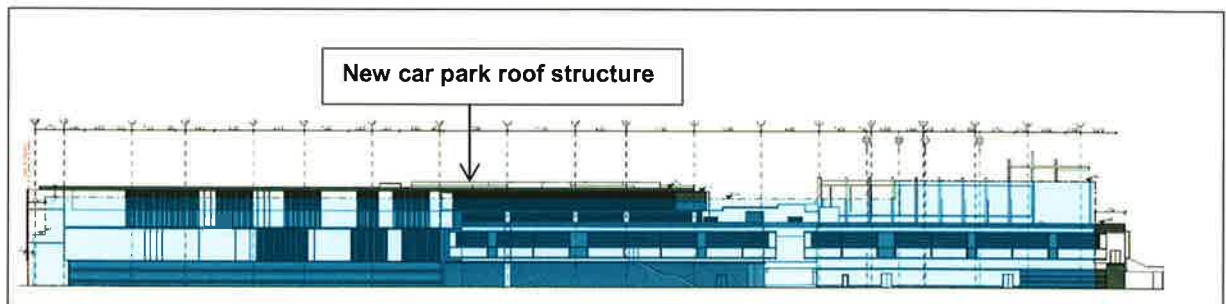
Northern elevation (Woolooware Bay foreshore) - approved envelope shaded blue (Source: Proponent's modification application, 2016).
